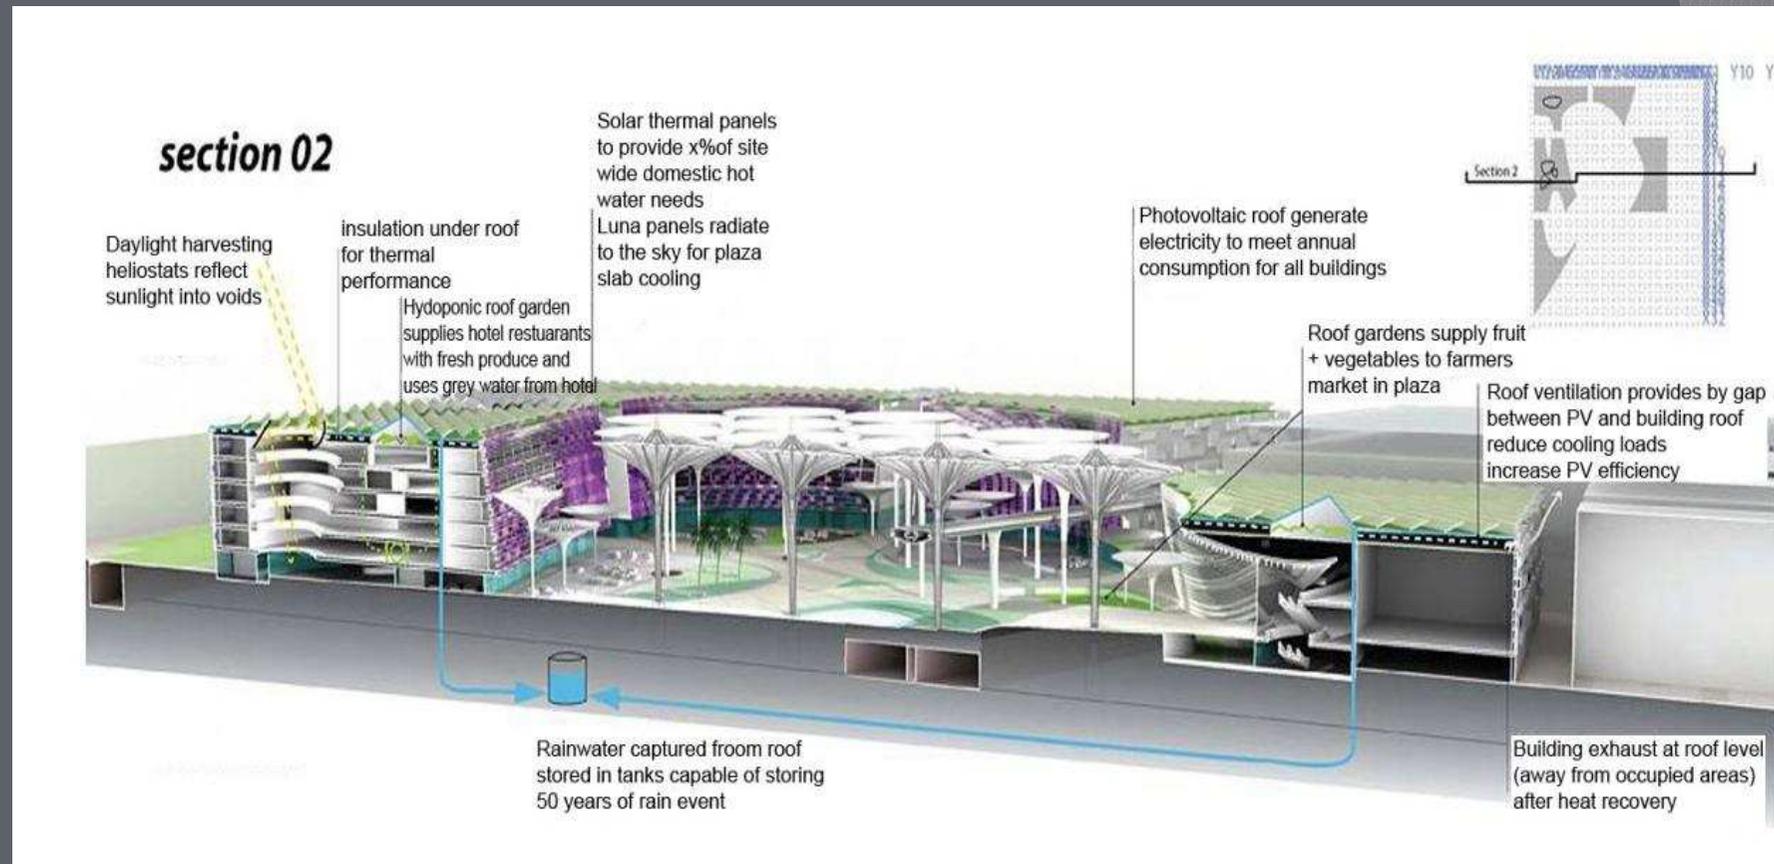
shows cross sections demonstrating water flows to underground water tanks.
